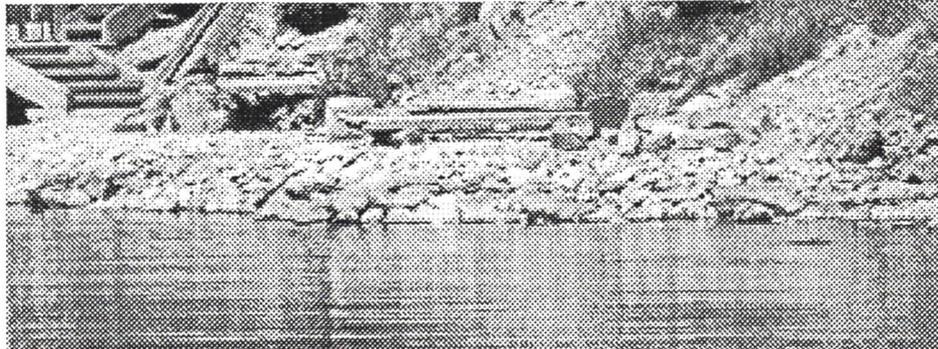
Rock rip rap similar to one proposed for lakeshore at Wayfarers State Park.
